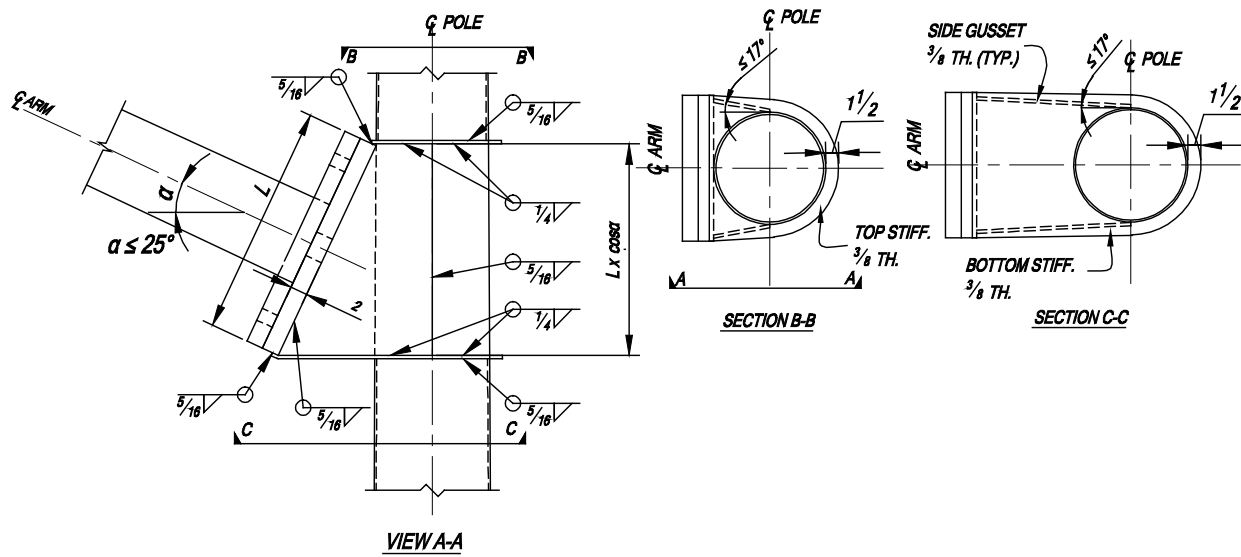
Details of fillet-welded ring-stiffened box connections
